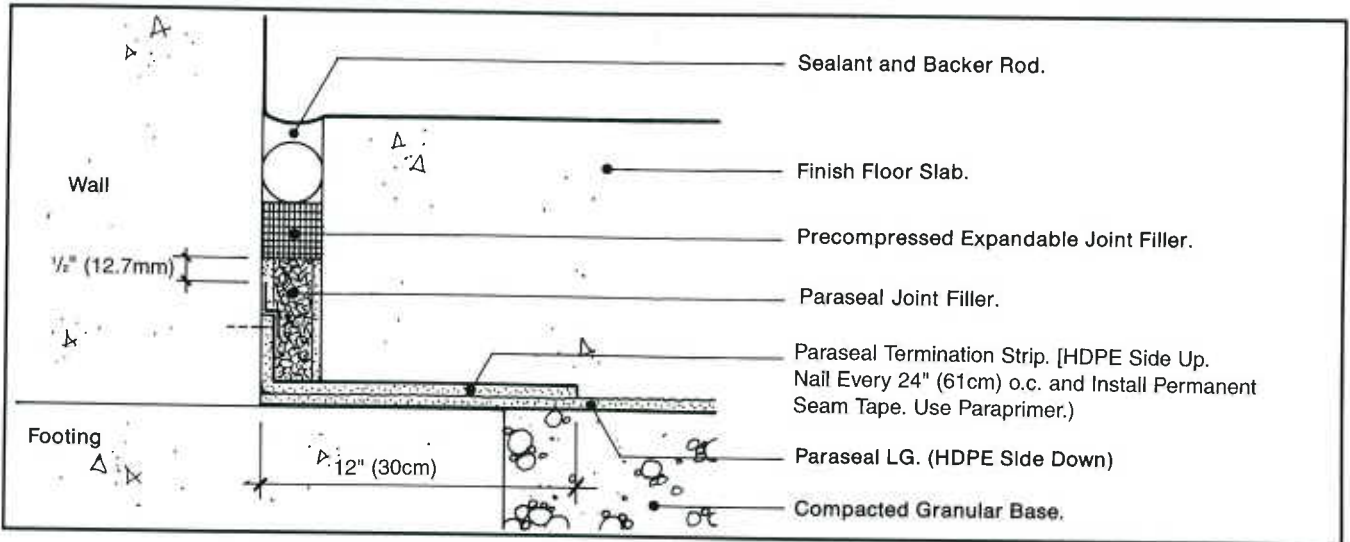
Termination at Floor to Interior Wall Face. - HDPE Side Down
